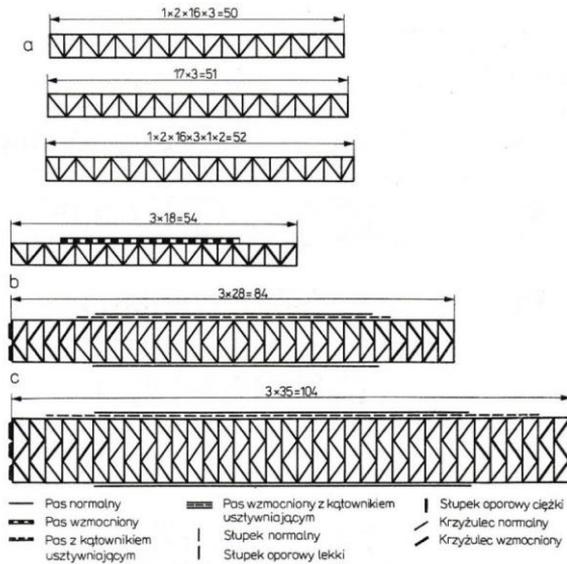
Diagrams of the main girders in the spans of folding bridges of the R70 system (Białobrzeski, 1978; Miklin & Sawicki, 1993): a - single-storey girders, b - two-storey girders, c - three-storey girders.
